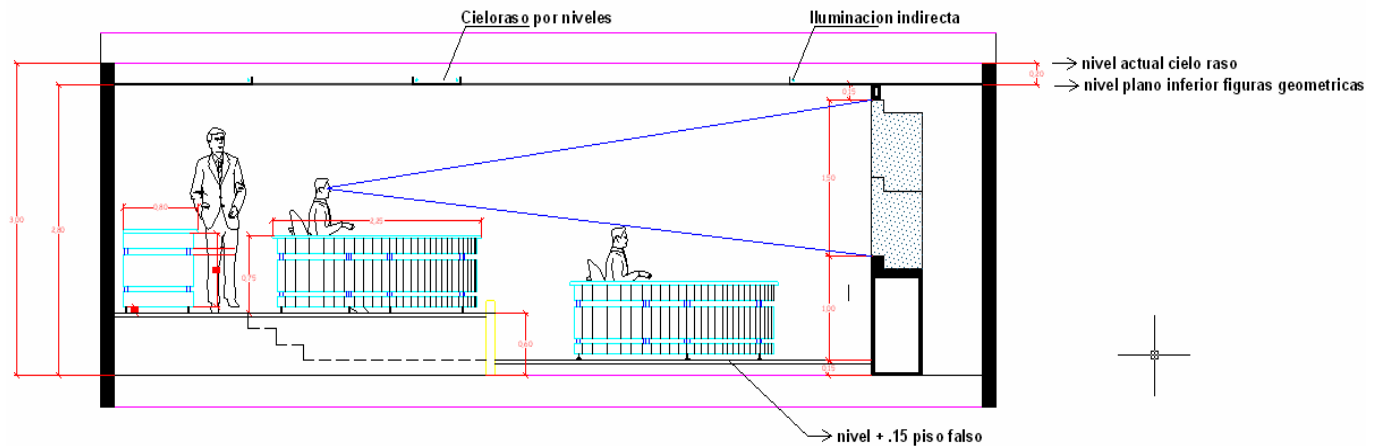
59 83-3: Conceptual perspective showing consoles, indirect lighting, raised access floor, and video wall
